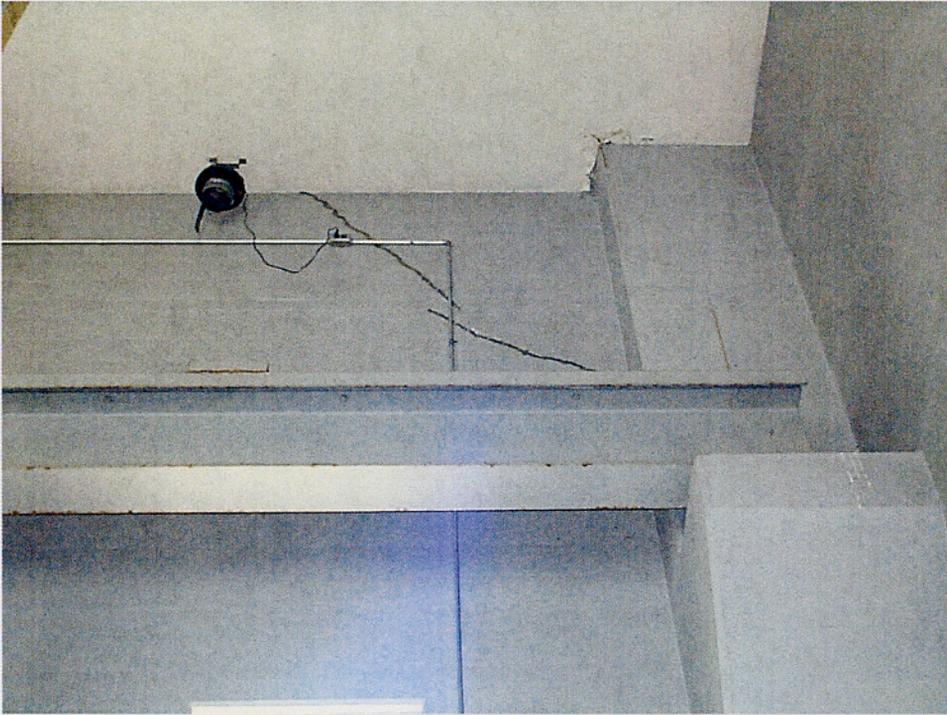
Interior of control tower, northeast corner. Note peeling paint on ceiling and sealed cracks.
